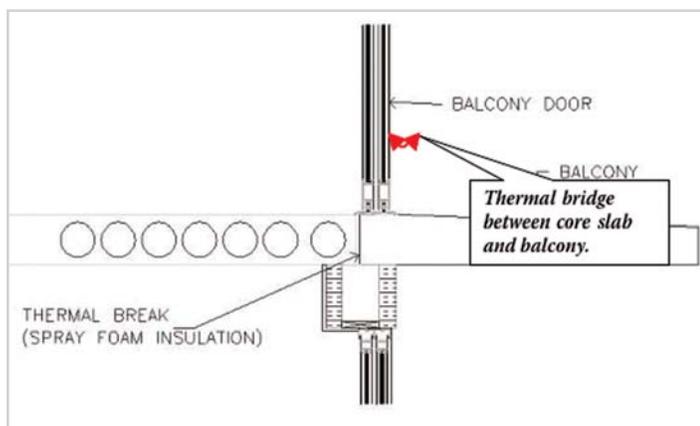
Construction detail showing thermal bridging at wall-balcony intersection
